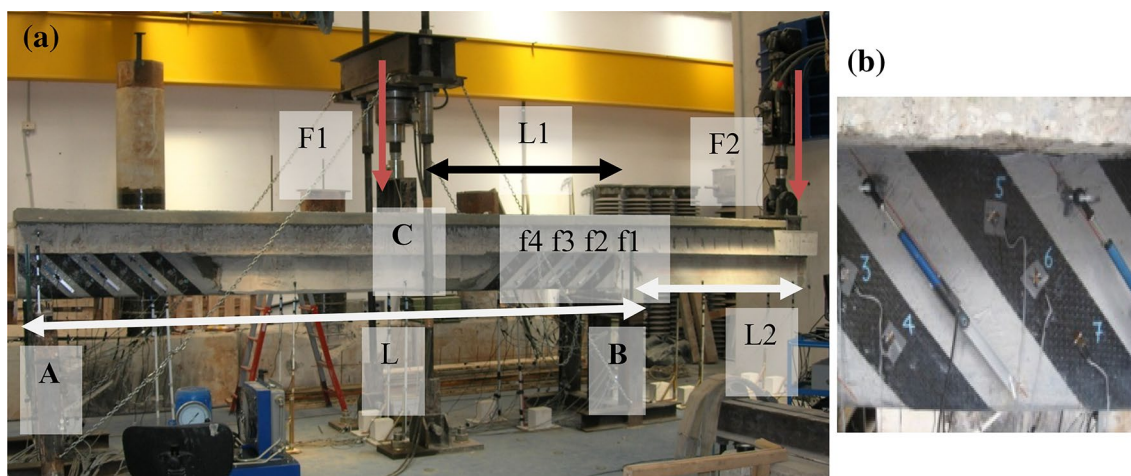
Retrofitted beams in test apparatus: a retrofitted beams in the test apparatus; b potentiometers and strain gauges on the C-FRP strips
